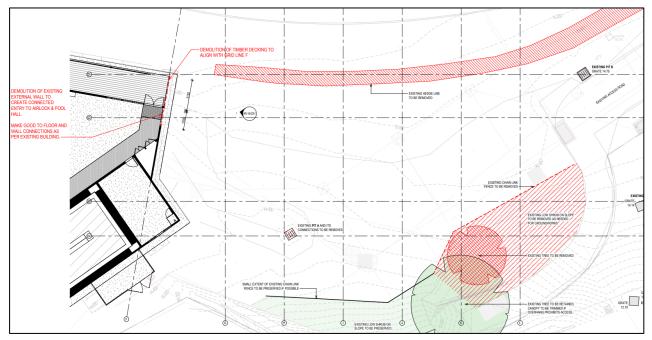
Demolition plan showing the existing hedge line adjoining the training oval to be removed and low shrub at the south-western corner of the location of the proposal pool facility (*Source: Demolition Plan, prepared by Populous, dated 15 December 2023*)
